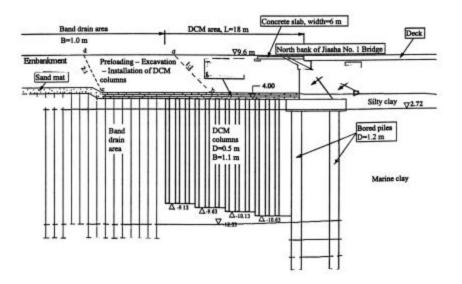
Elevation View of Bridge Approach Utilizing Deep Cement Mixing Columns, North Approach Jiasha No.1 Bridge, Lin, et al., (1999).
